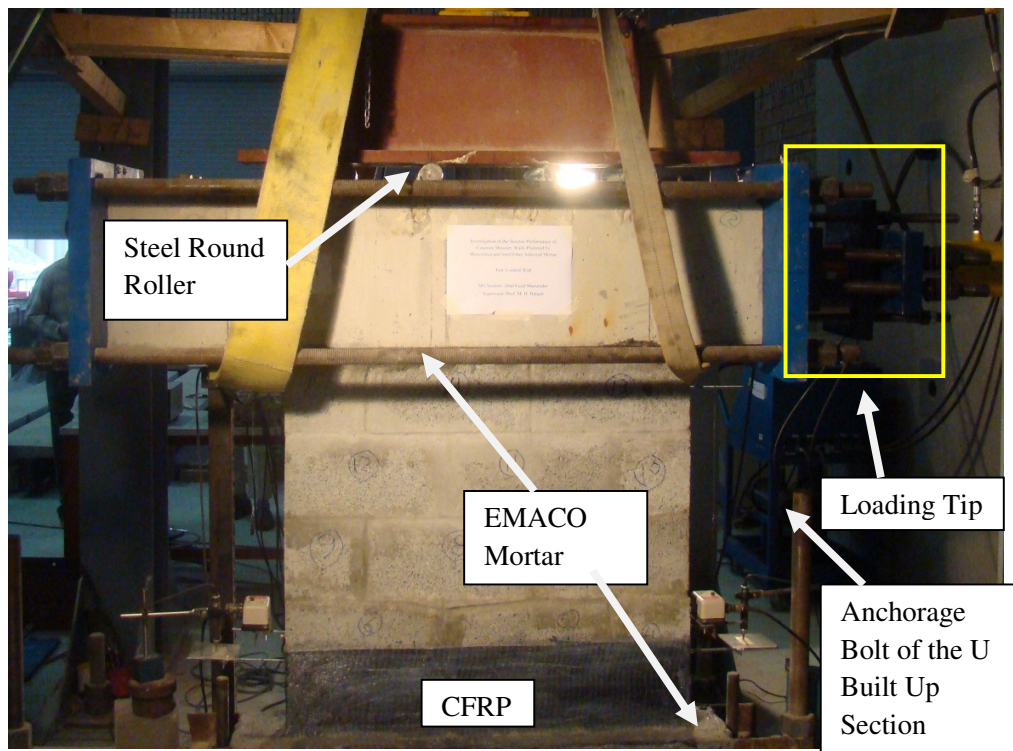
Cyclic Test Setup for NCMW Wall
